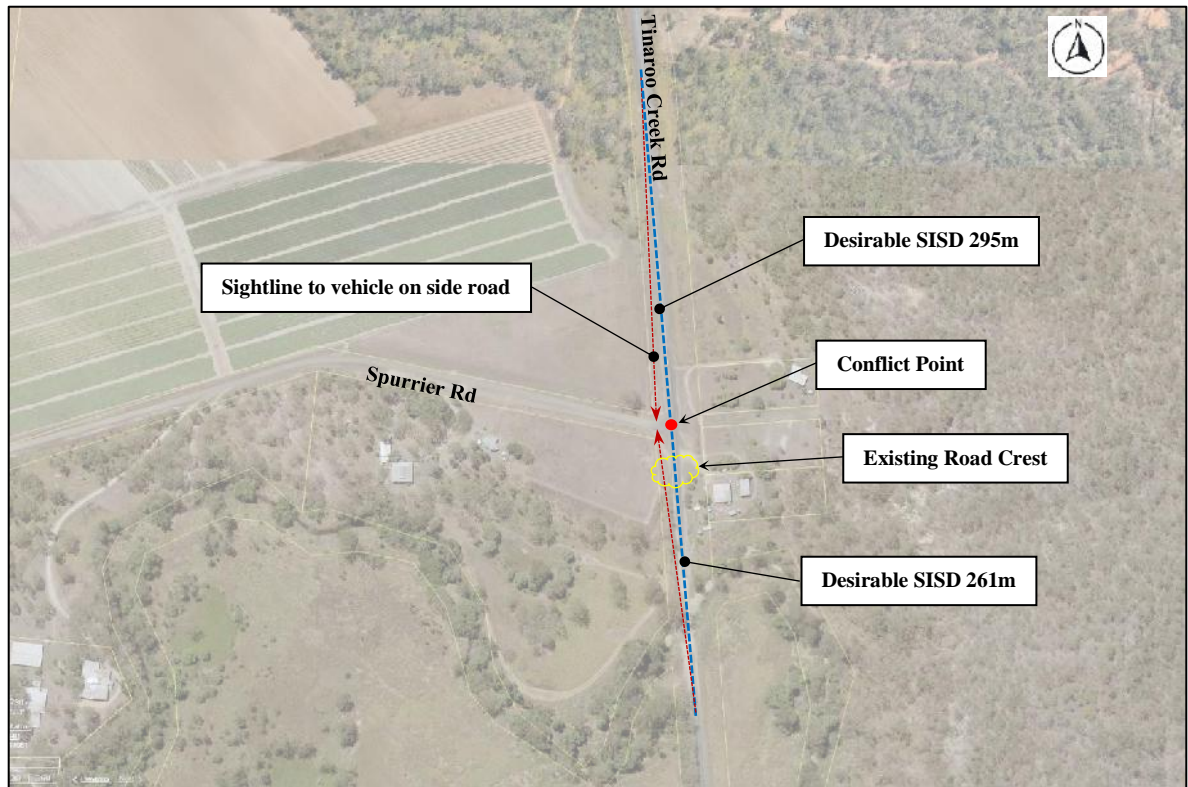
Tinaroo Creek Road/Spurrier Road Intersection - SISD Assessment
